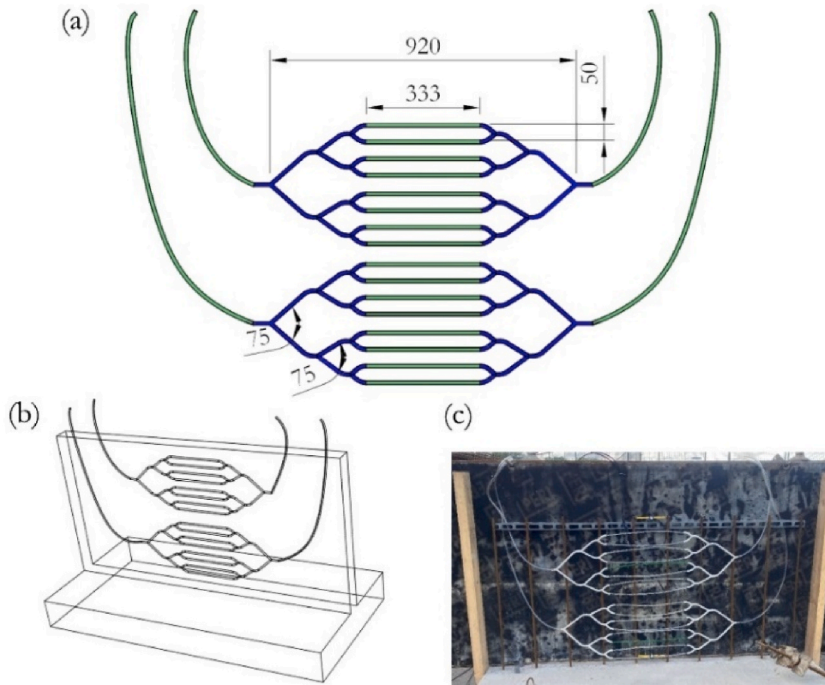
(a) Network dimensions where PU tubes are shown in green and 3D printed branched parts are shown in purple, (b) network placement in 3D CAD drawing, and (c) on-site conditions. Dimensions are given in mm.
